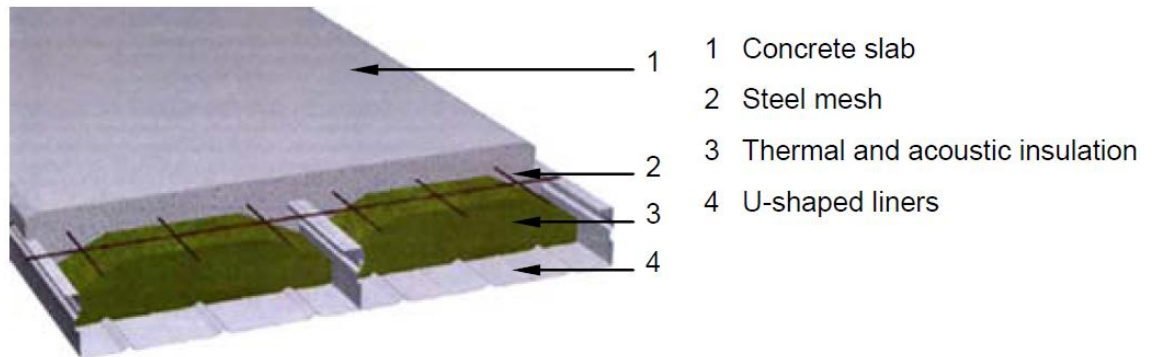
Prefabricated composite floor slab (Arcelor Mittal & Peiner Träger 2008b)
